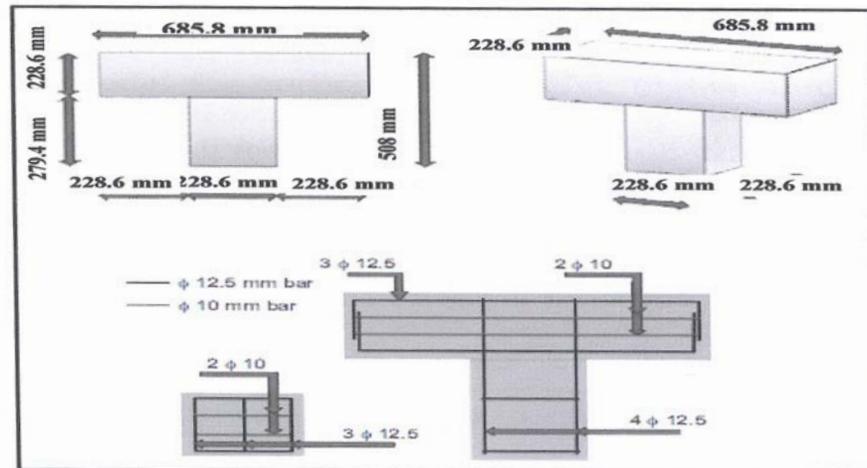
Details of corbel geometry and steel reinforcement. [10]
